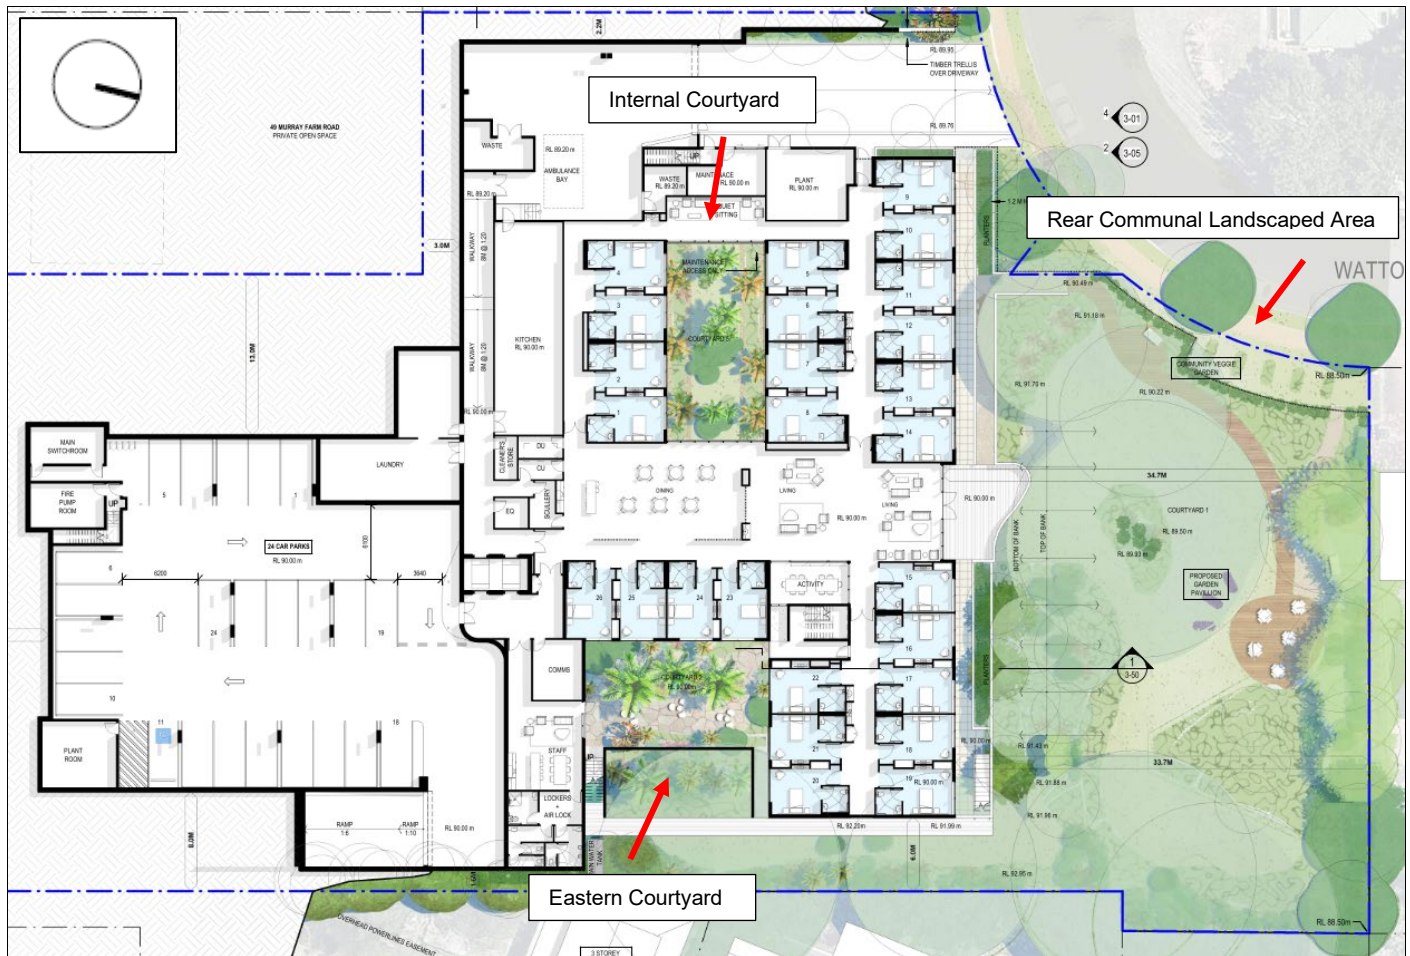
Proposed lower ground floor. Source: Thomas Adsett.
